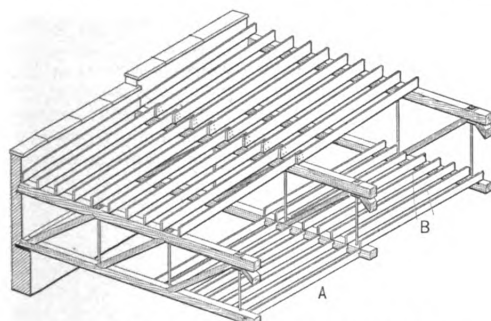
Roof where Rafters Rest on Top Chord of Truss.
